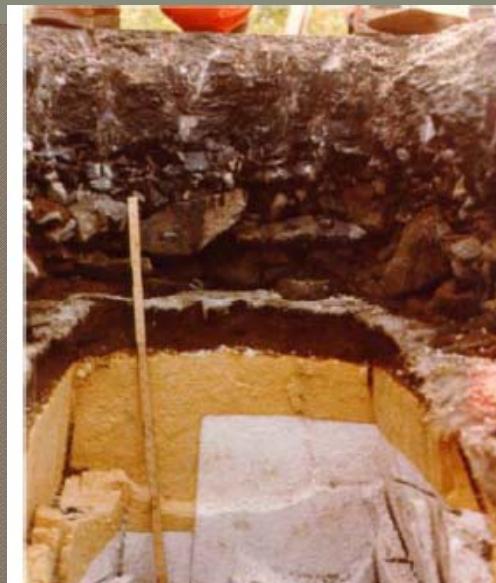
Excavation of the first EPS embankment at Flom bridge (EPS and polyurethane as protective layer).
